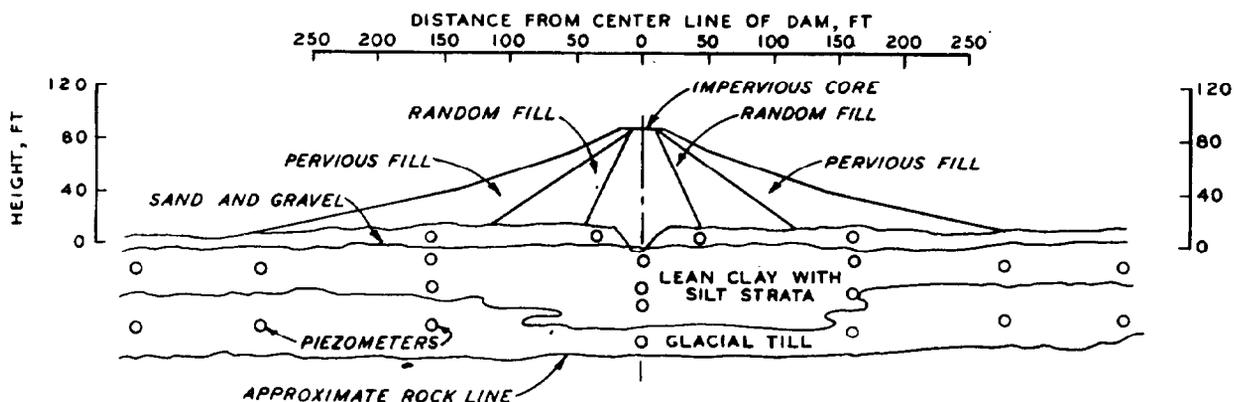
Example of foundation piezometer installation of Surry Mountain Dam (from EM 1110-2-1908)
